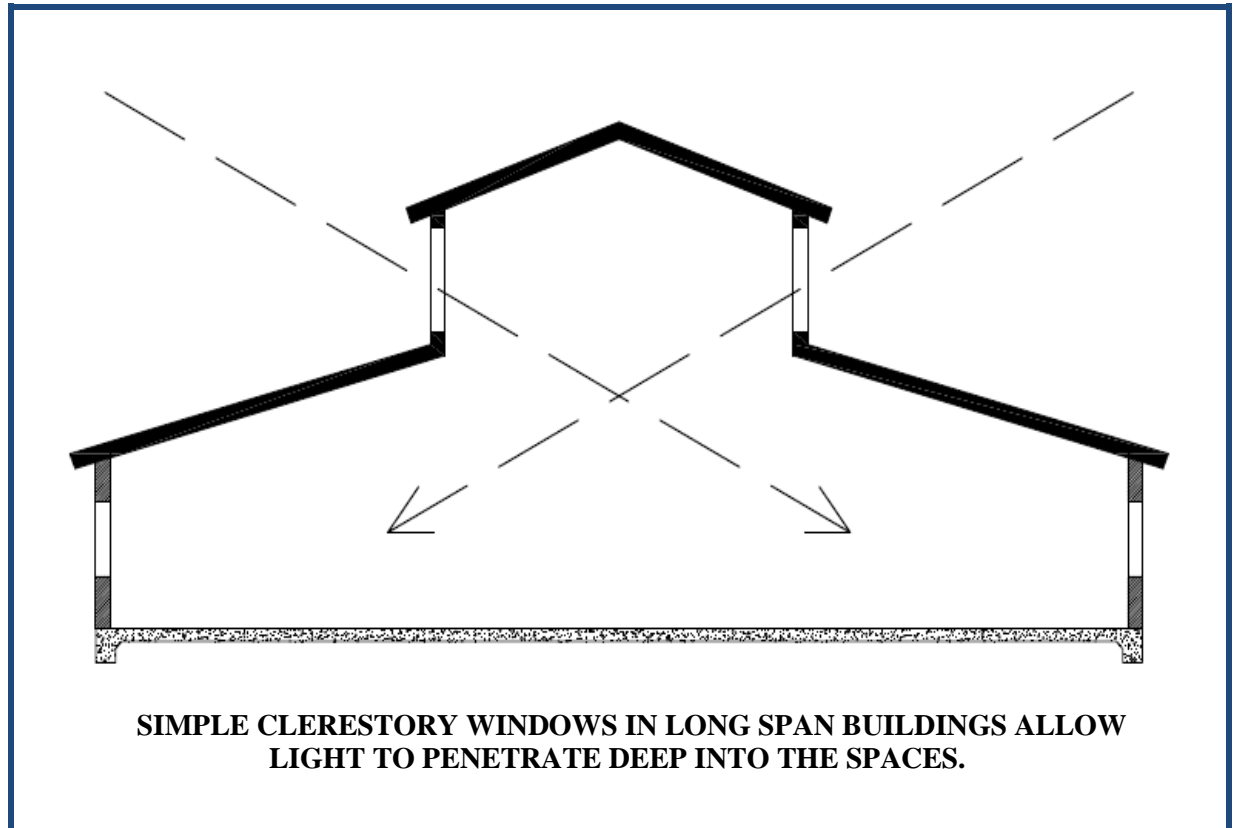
C: Simple Clerestory Window in Long Span Building
